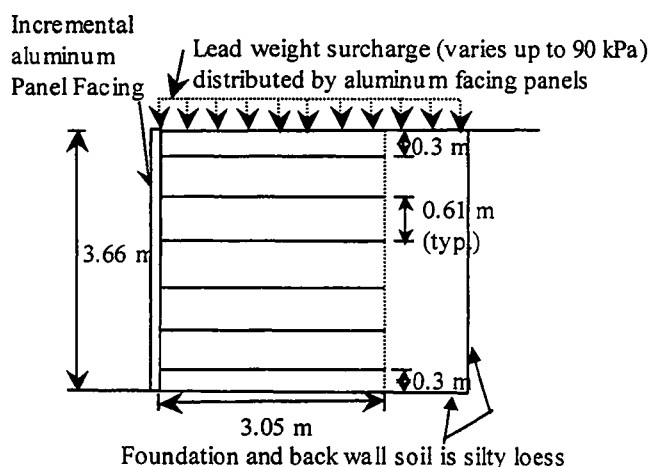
WES steel strip test wall (adapted from Al-Hussaini and Perry, 1978).
